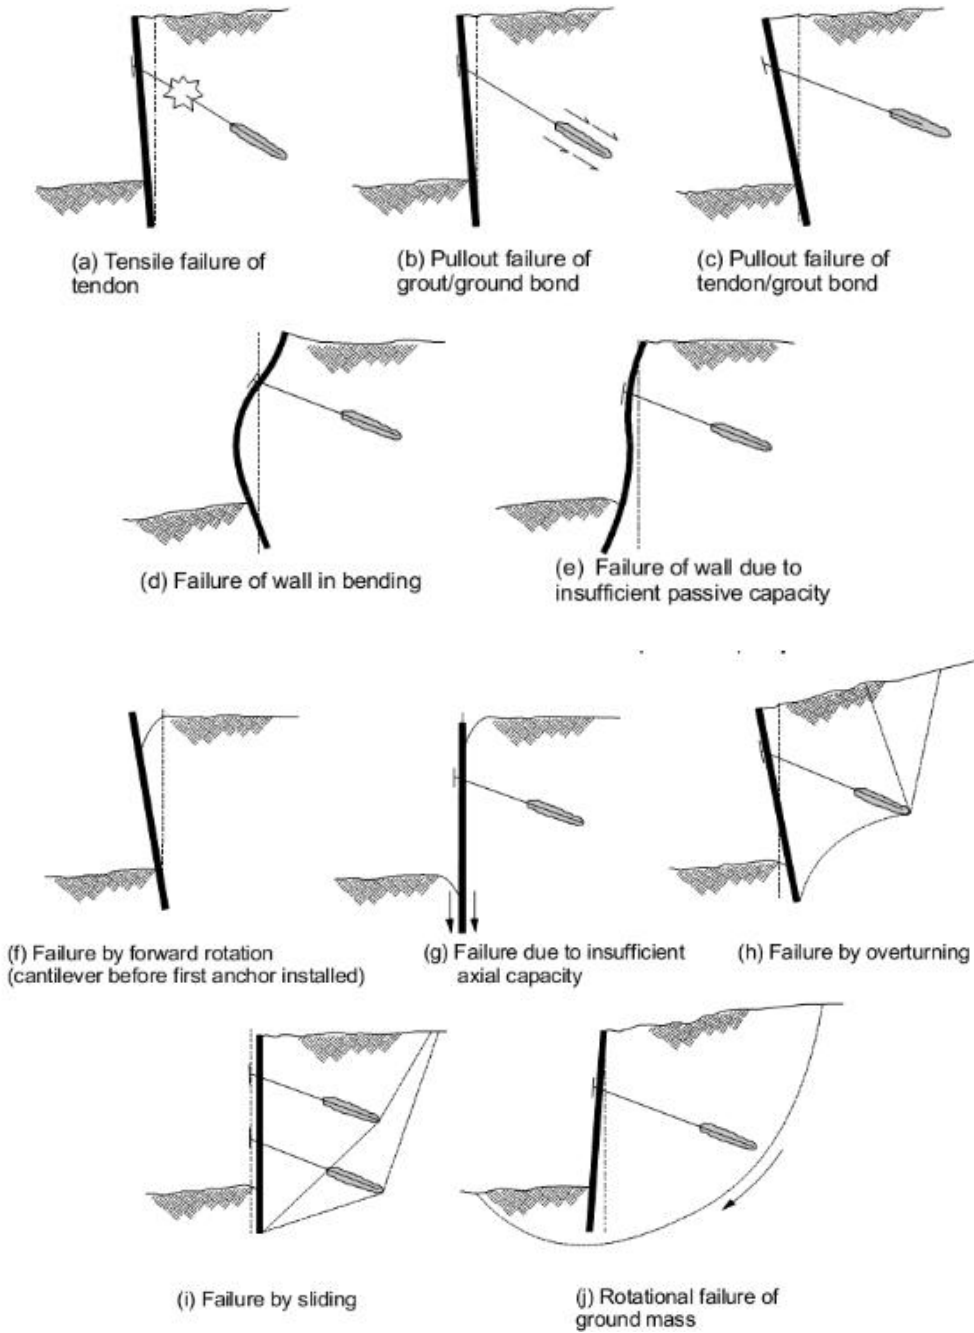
Failure modes for tie-back retaining walls [Source: Sabatini et.al, 1999]
